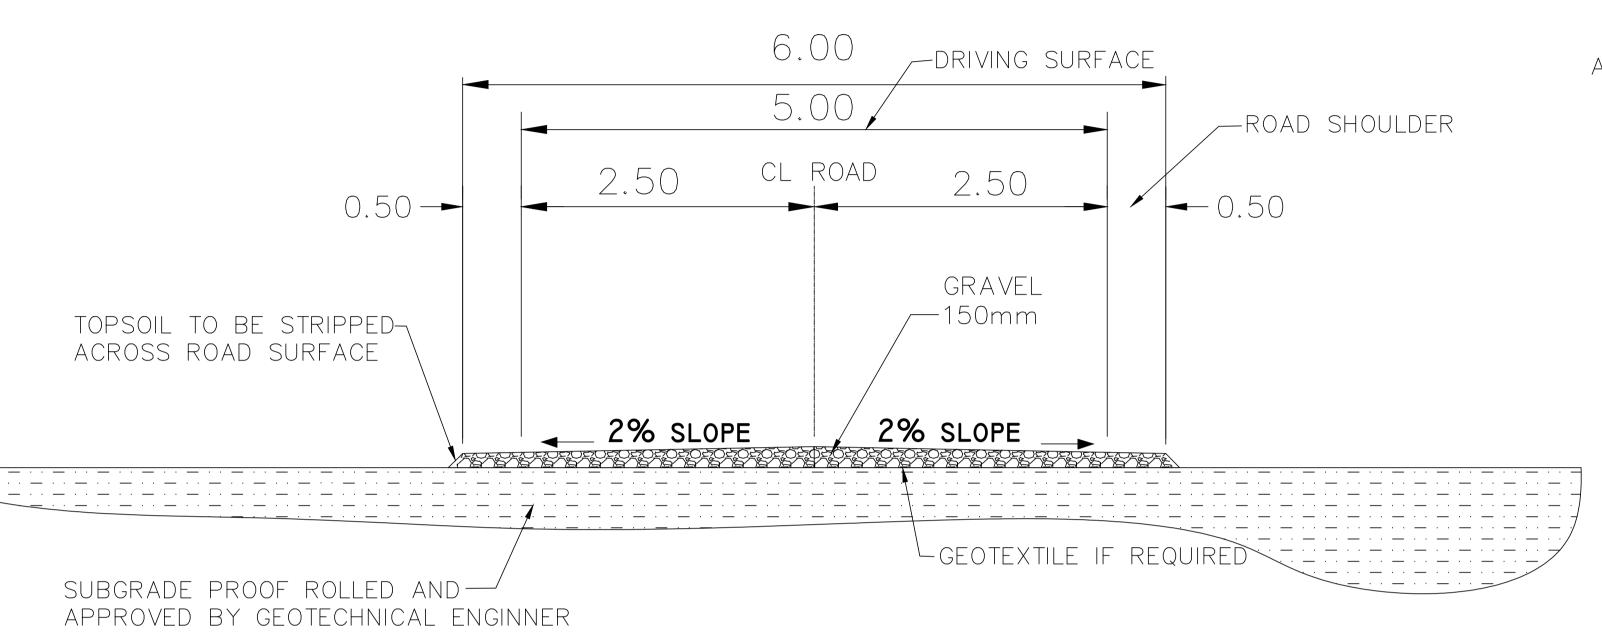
Detail B – Minimum Municipal Road cross section Concept for Permit Only
